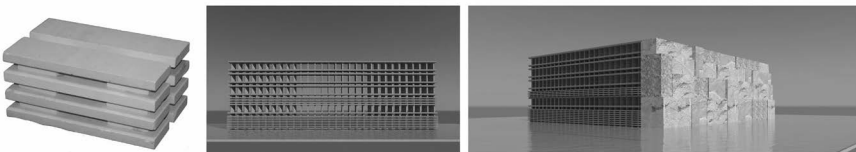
Module of laminar stone. Ventiladed and shaded façade of laminar stone.
